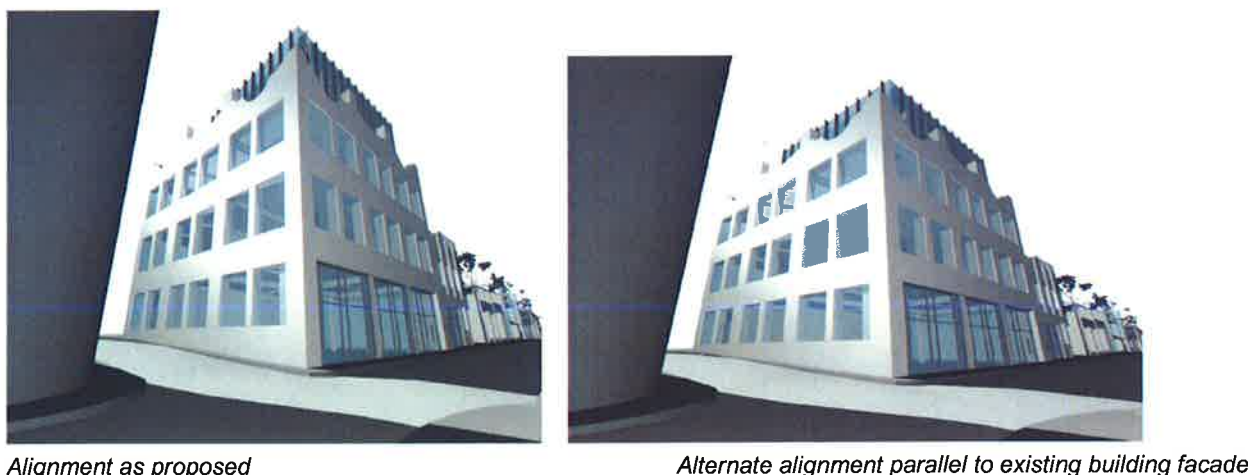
3D views of alignment of addition to 2-10 Kensington Street (source: TZG)
